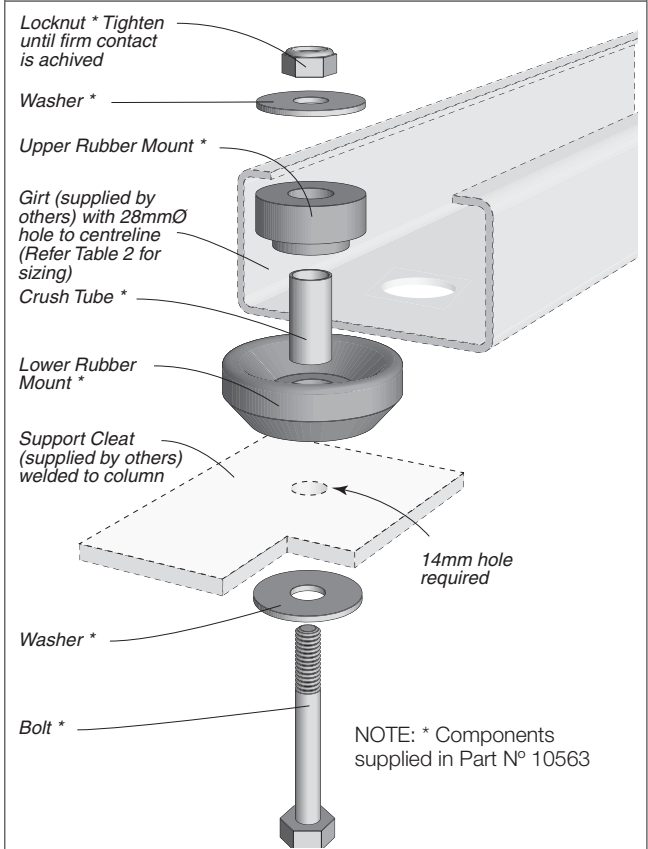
GYPROCK CINEMA WALL MOUNT PART N° 10563.
